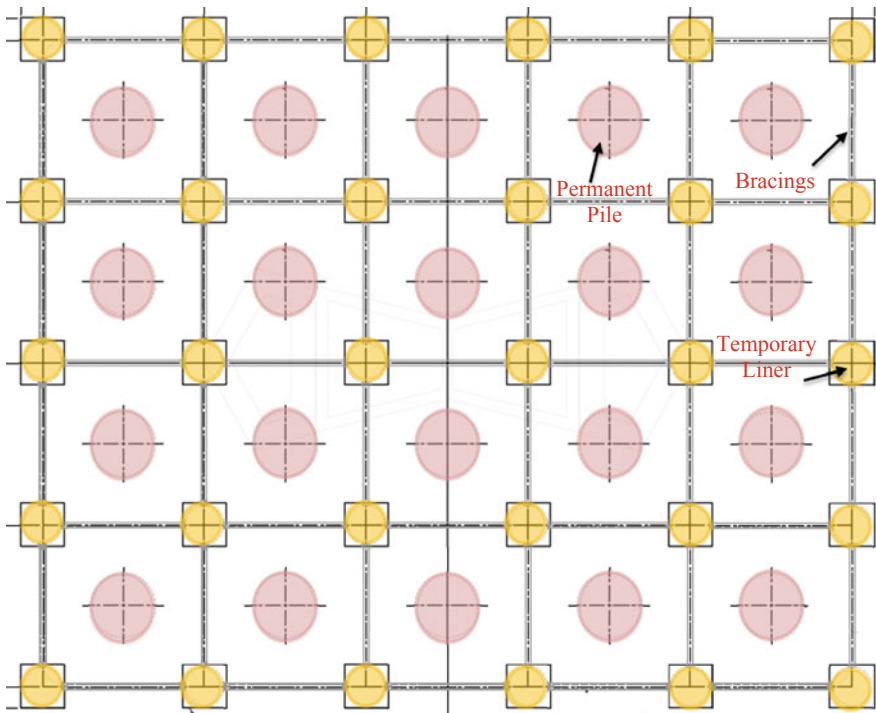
Plan View of permanent piles and temporary liners for piling platform
